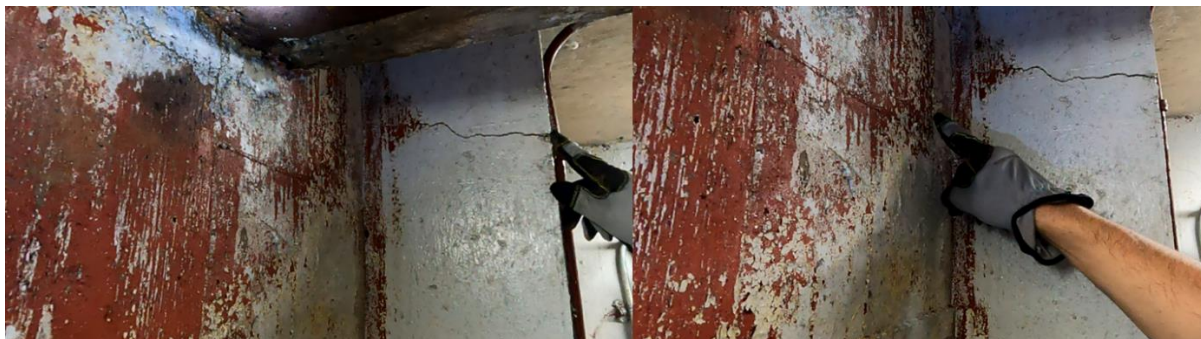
Crack on the east wall, that goes through the south-east column
